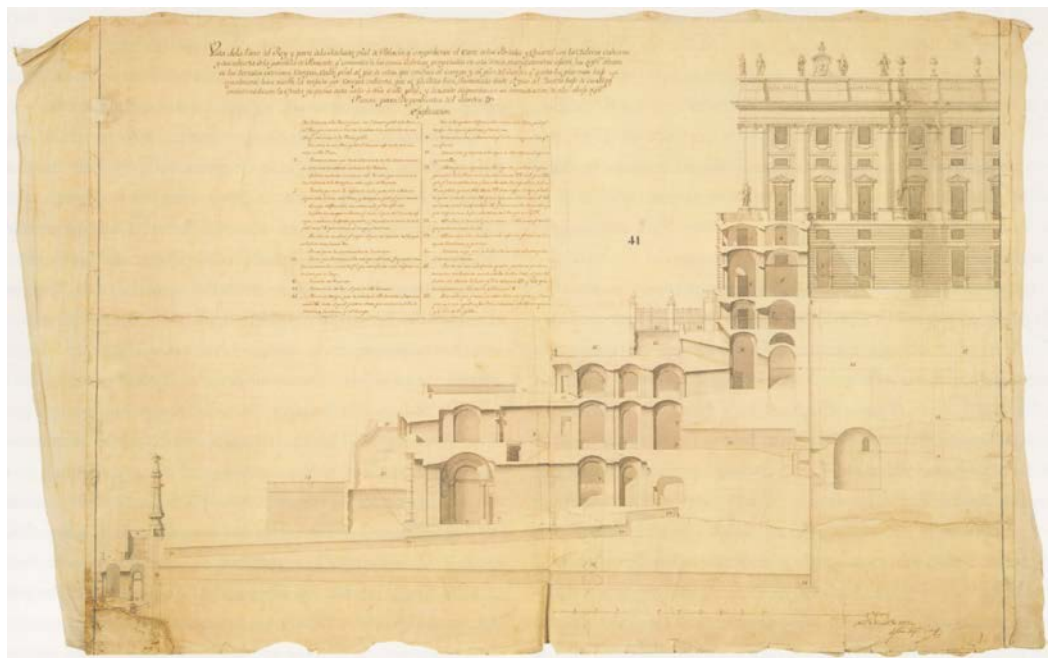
Giovanni Battista Sacchetti, Cross section of the ramps to the Royal Parc, 1757. Archivo General de Palacio, Palacio Real, Madrid.
